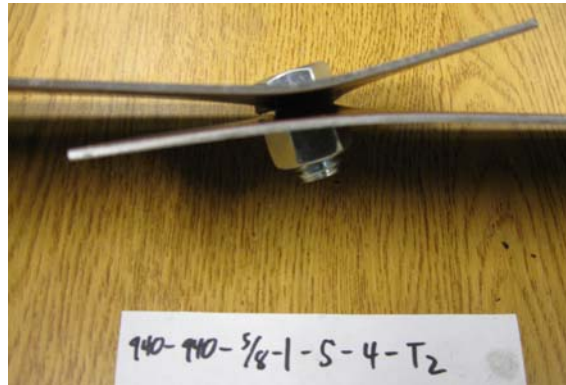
Sheet Bearing Failure of Test Specimen 94O-94O-5/8-1-S-4-T2
